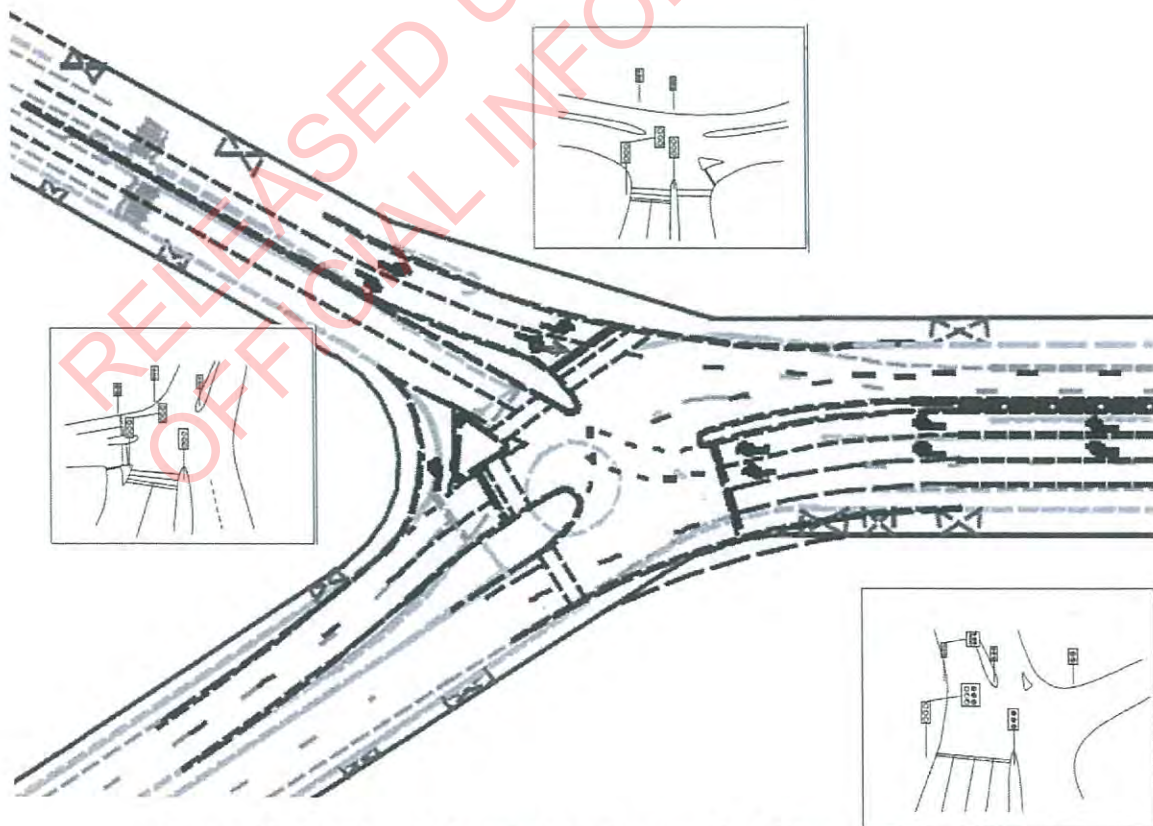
Proposed Signalisation Layout for Hillcrest Intersection
